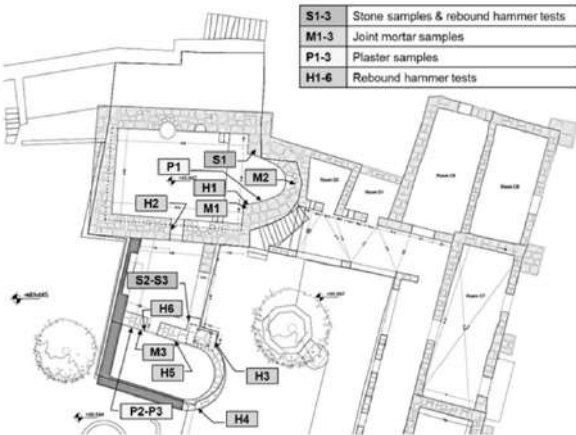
Plan drawing* of the north-east corner showing the approximate positions where building stones (S1-3), jointing mortars (M1-3) and plasters (P1-3) were sampled and the positions where rebound hammer tests were performed on masonry stone blocks (S1-3 and H1-6).
